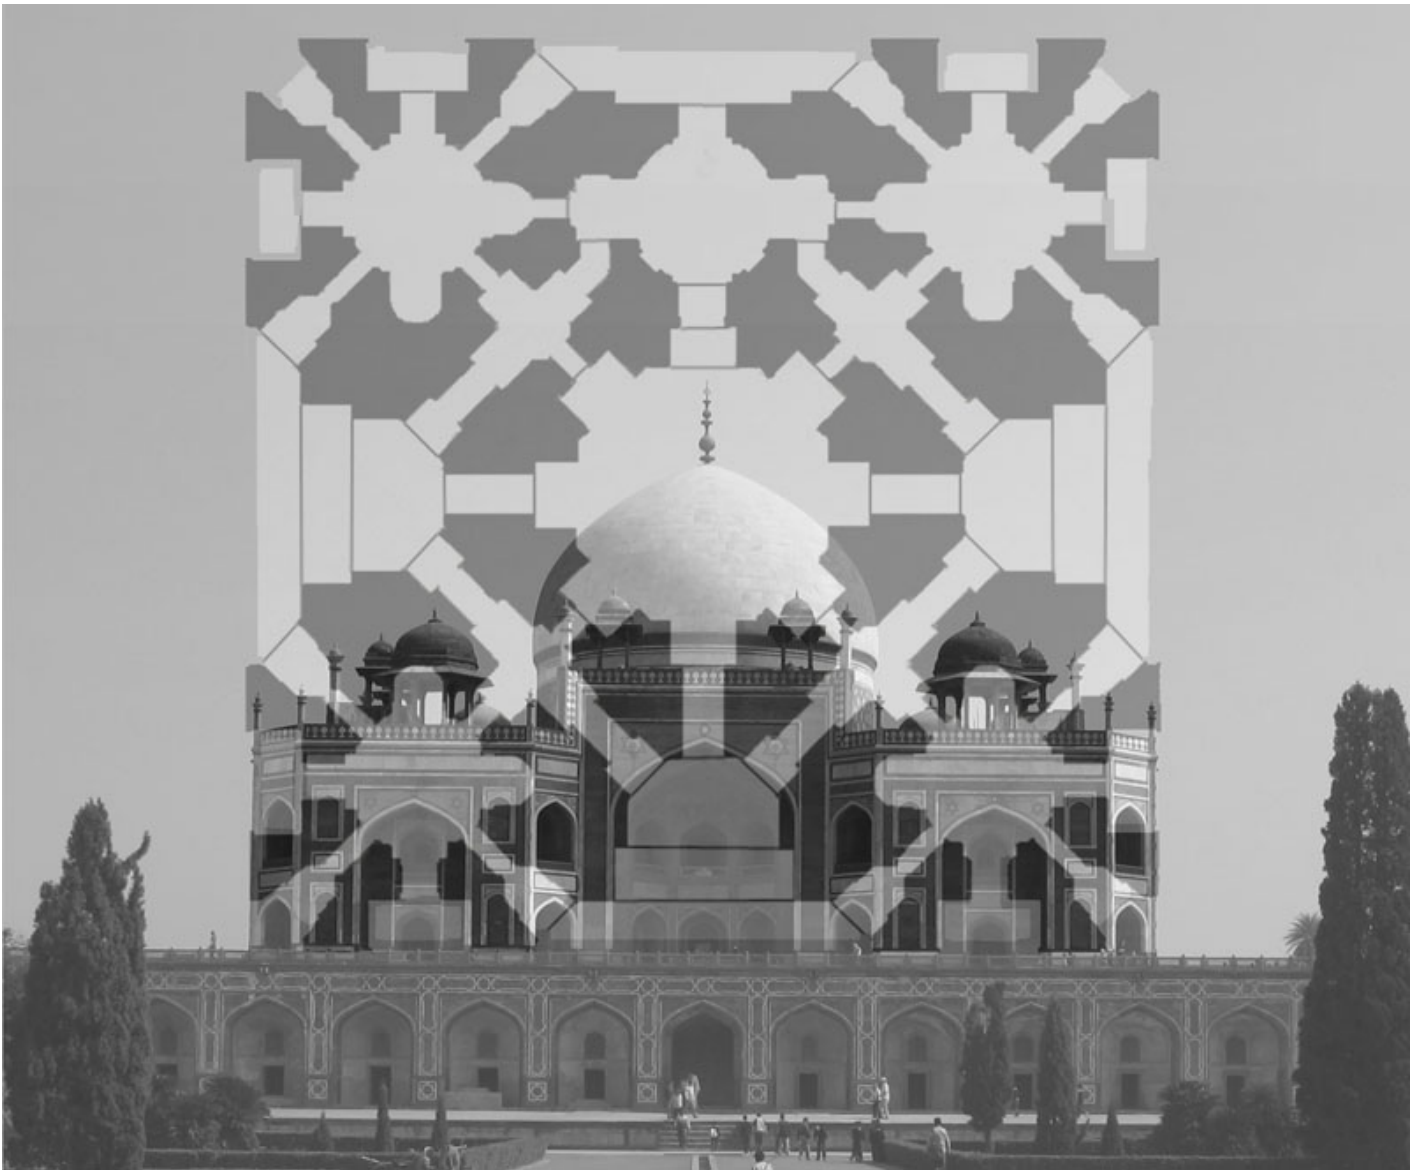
Floorplan overlaid on elevation, Humayun's Tomb.
